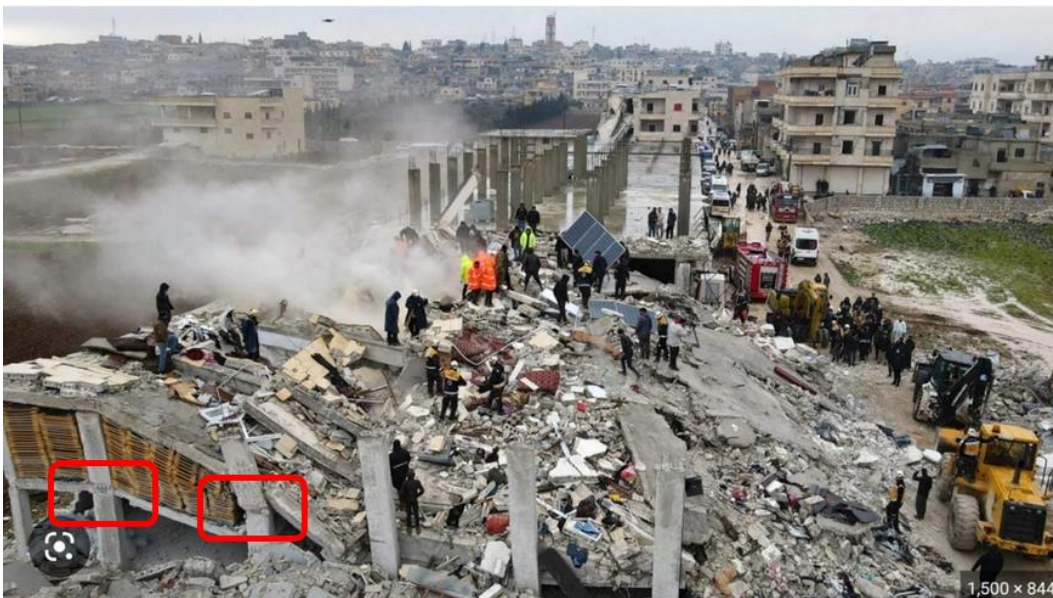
A collapsed building in Samada, Northern Syria (Source: [Reuters](#)). Notice the light column reinforcement and separation of slab from columns (in red rectangles) in the collapsed building.
